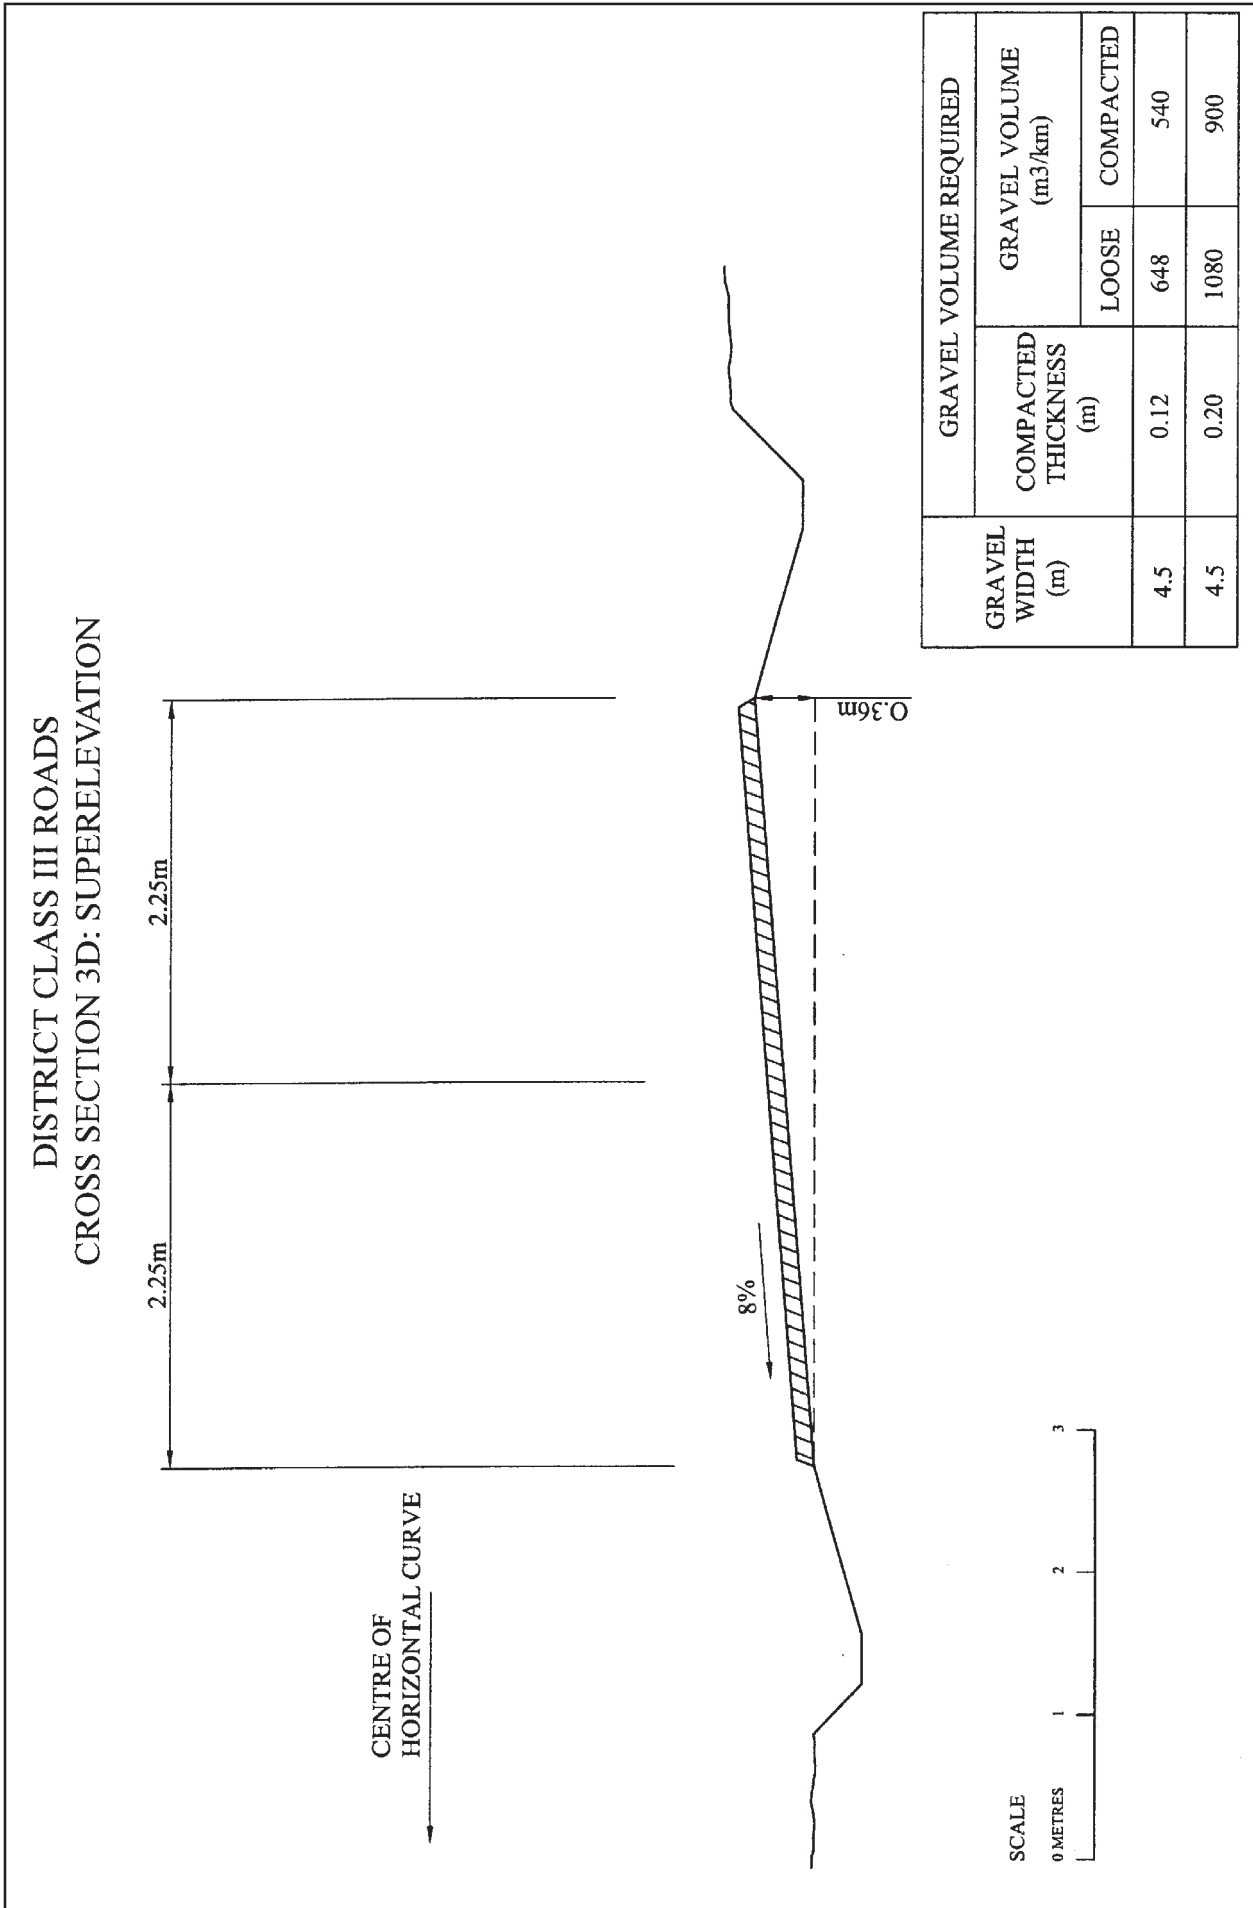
B3: DISTRICT CLASS III ROAD - CROSS SECTION 3D FOR SUPERELEVATION
